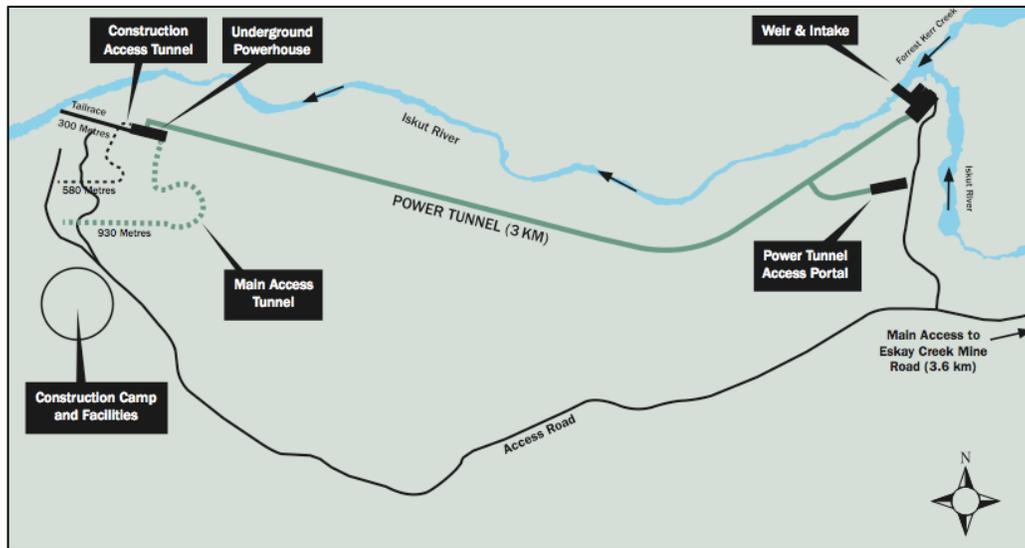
Forrest Kerr hydroelectric facility layout (adapted from AltaGas 2013).
